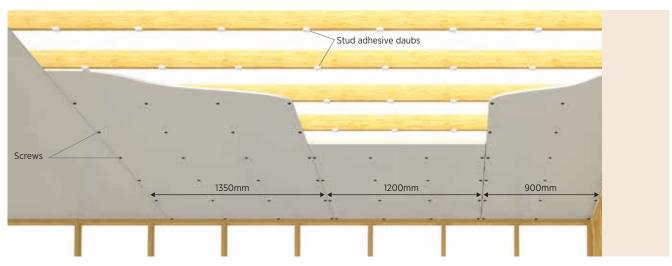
Combination adhesive and screw fixing to ceilings – 1/3 fixing method
